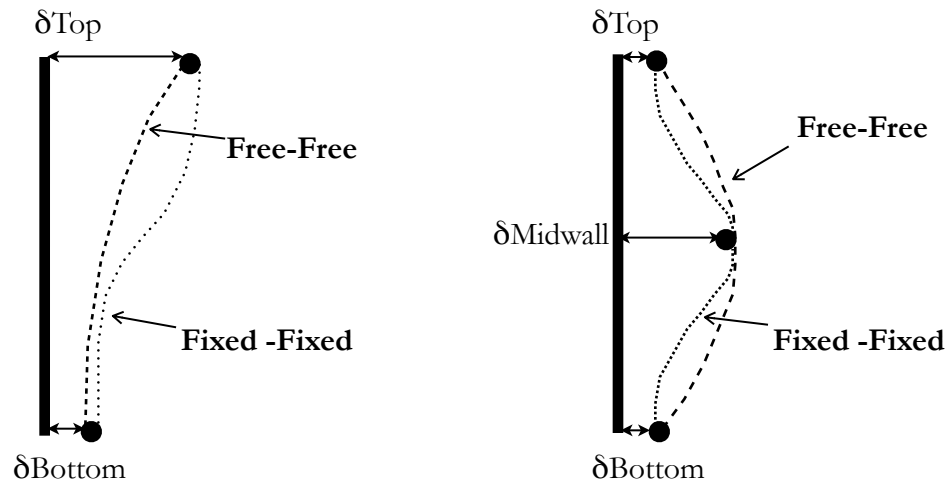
Figure X - Left: Elevation view of two possible mode shapes for superstructure response- Right: Elevation view of two possible mode shapes for wall response
